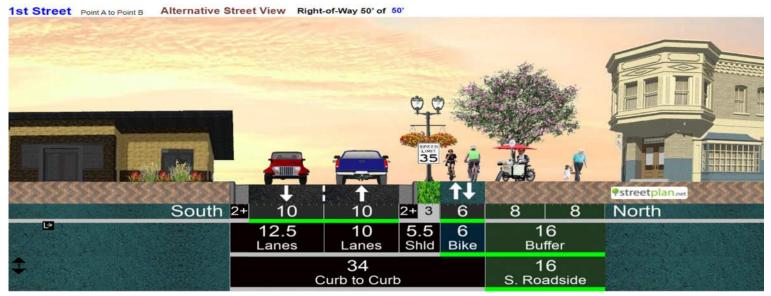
Street Design along 1st Street Source: EHRA design using StreetPlan
